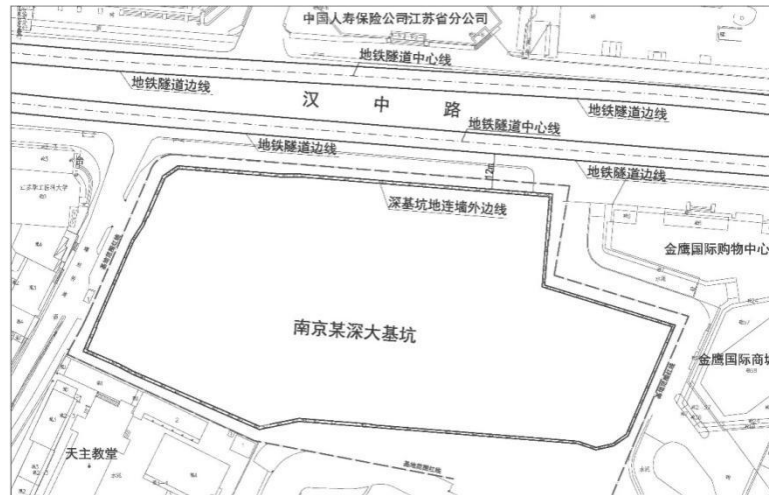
General Layout Plan of the Excavation Pit Construction Site
